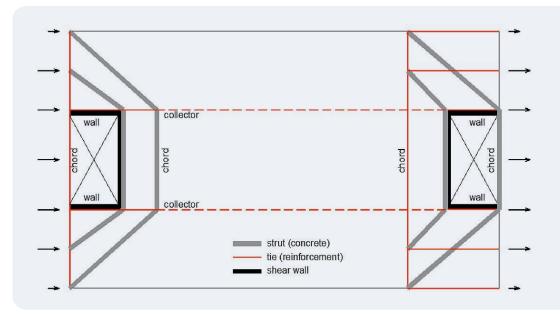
Strut and tie model for wind load perpendicular to the short side of the building.
